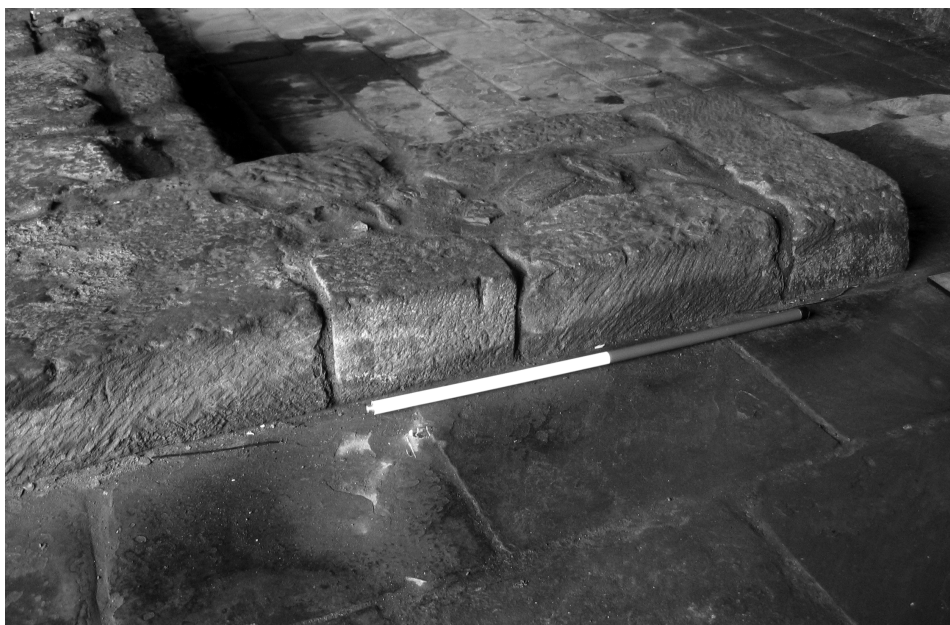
Building 68: external west face showing tooling and suggested north jamb of doorway. The paving is part of post-excavation landscaping. Scale 1 m.
